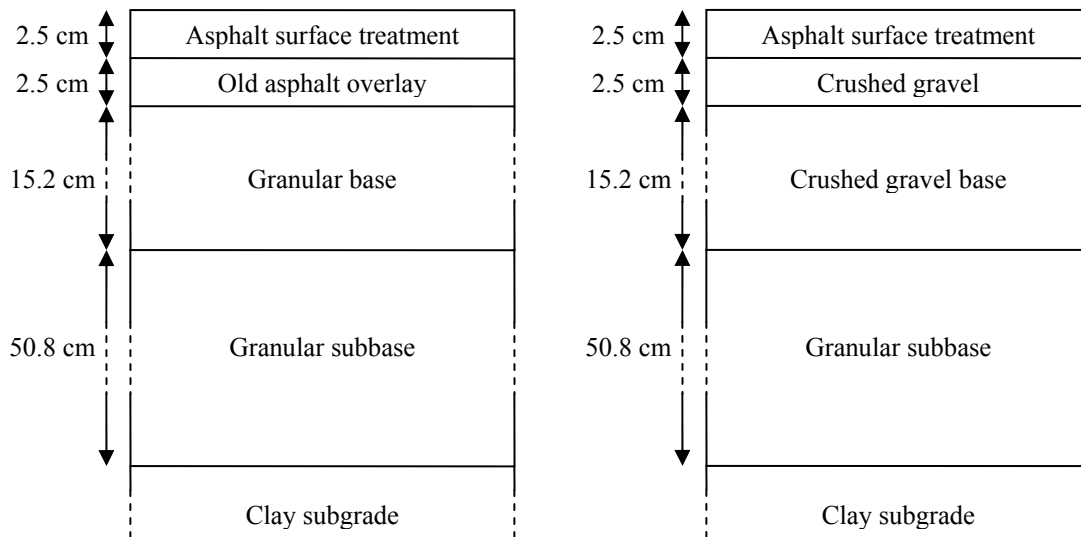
Target pavements (left: “asphalt road”; right: “gravel road”)
